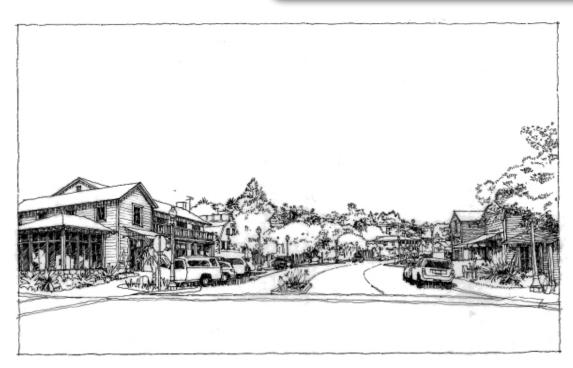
"Gateway" at Evans Avenue and Ortega Hill Road
